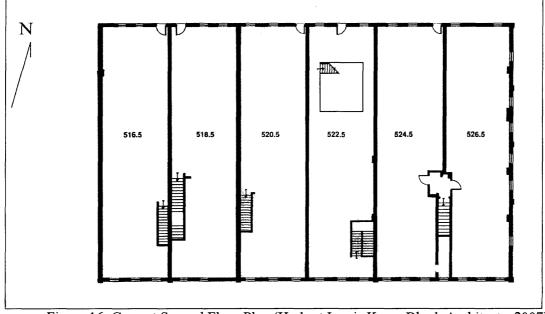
Current Second Floor Plan (Herbert Lewis Kruse Blunk Architects, 2007)
